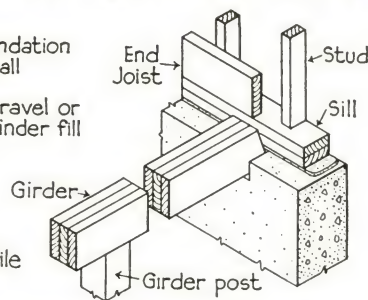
BUILT-UP GIRDER - END SET IN CONCRETE WALL
